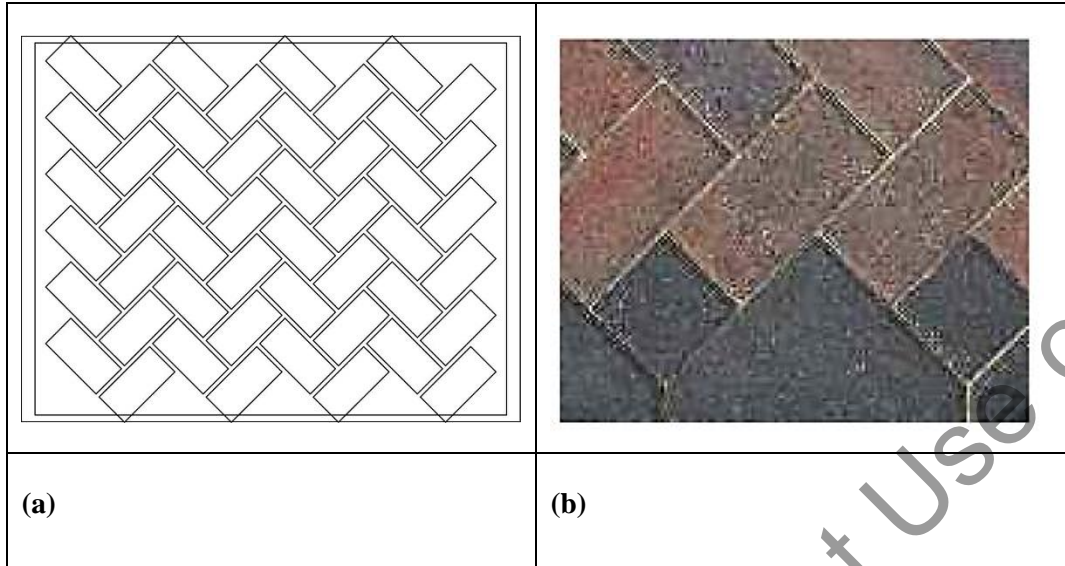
(a) A 45-degree Herringbone Laying Pattern Does Not Require Stitching and (b) Manufactured Edge Pavers Called “Bishops Hats” Can Be Used or Rectangular Pavers Cut to Fit
